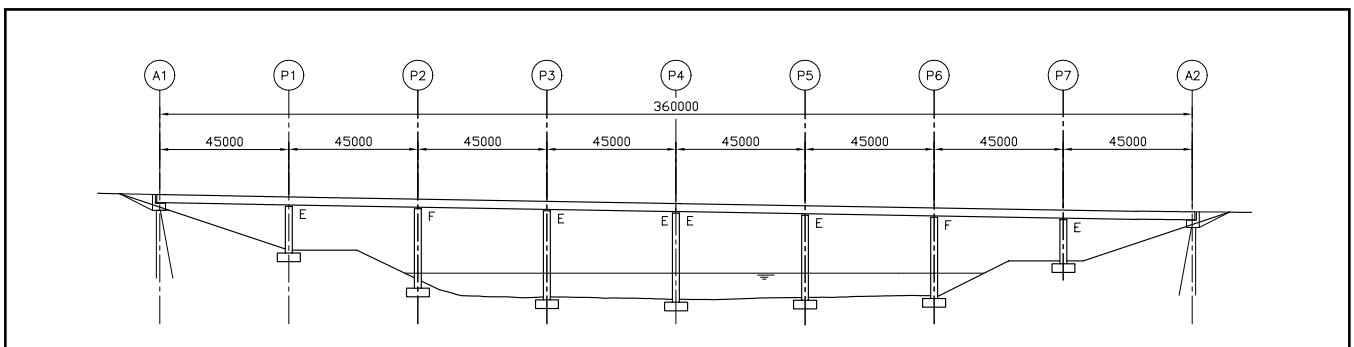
Bridge elevation, eight-span span-by-span precast segmental bridge.
